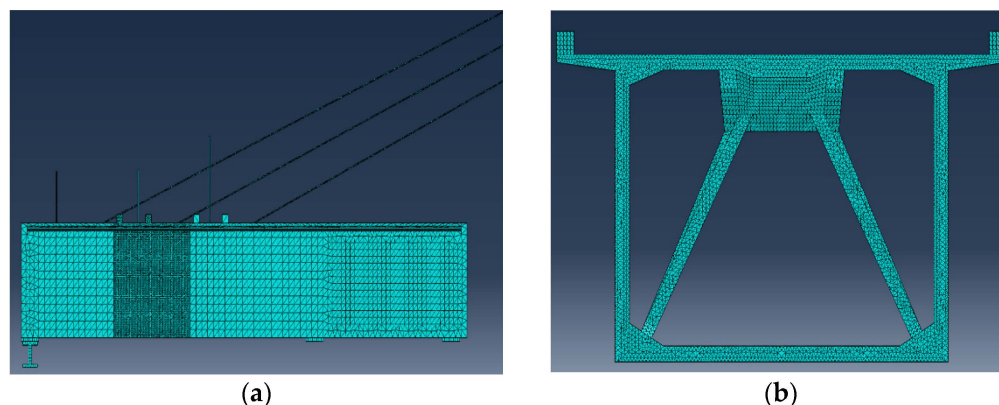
Finite element model: (a) side view; (b) cross-section view.
